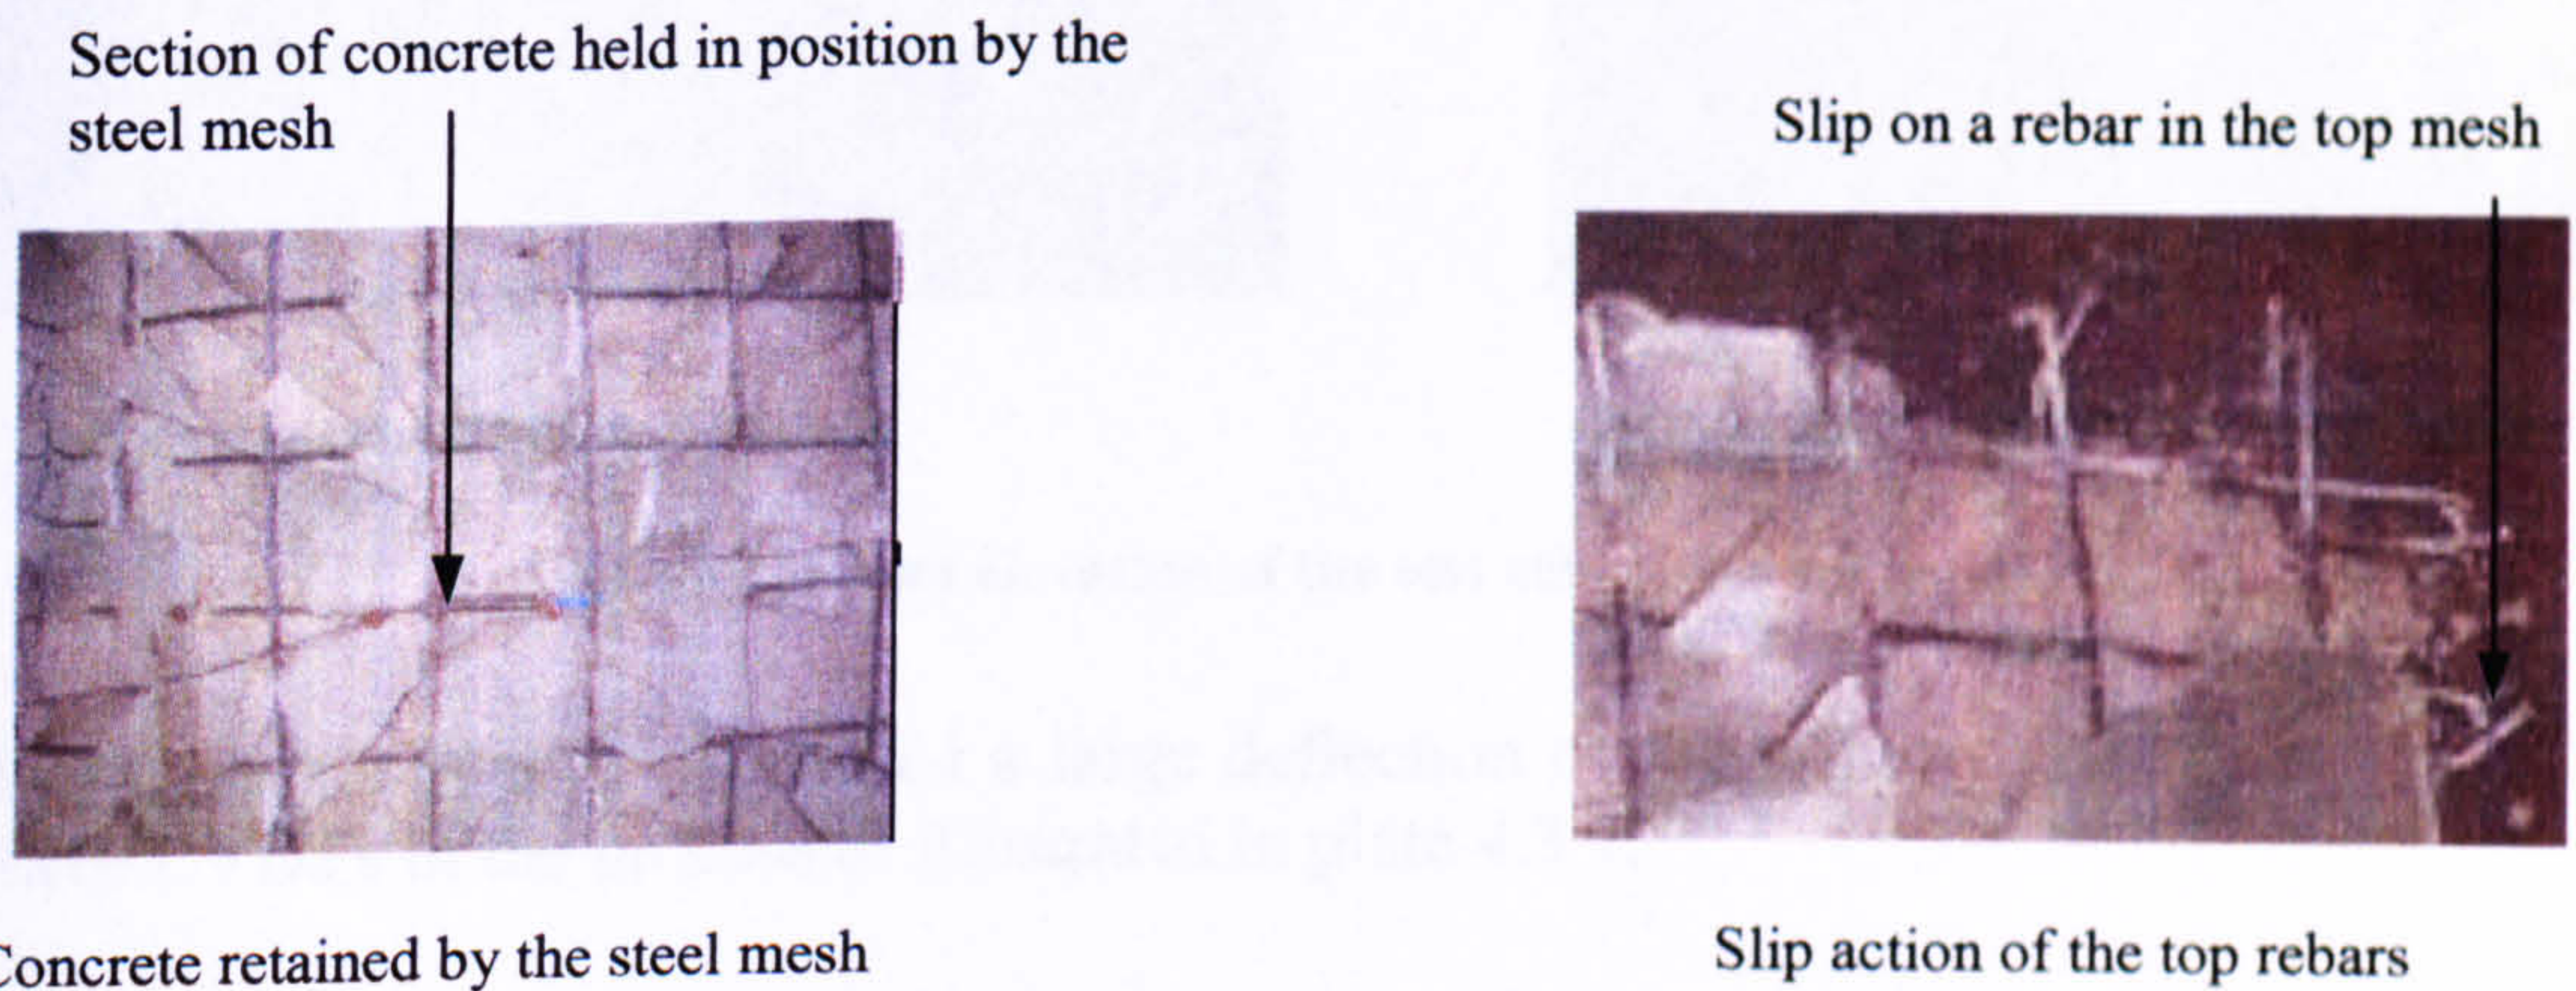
Damage to the bottom face of primary slab RCR73IT12-13.
